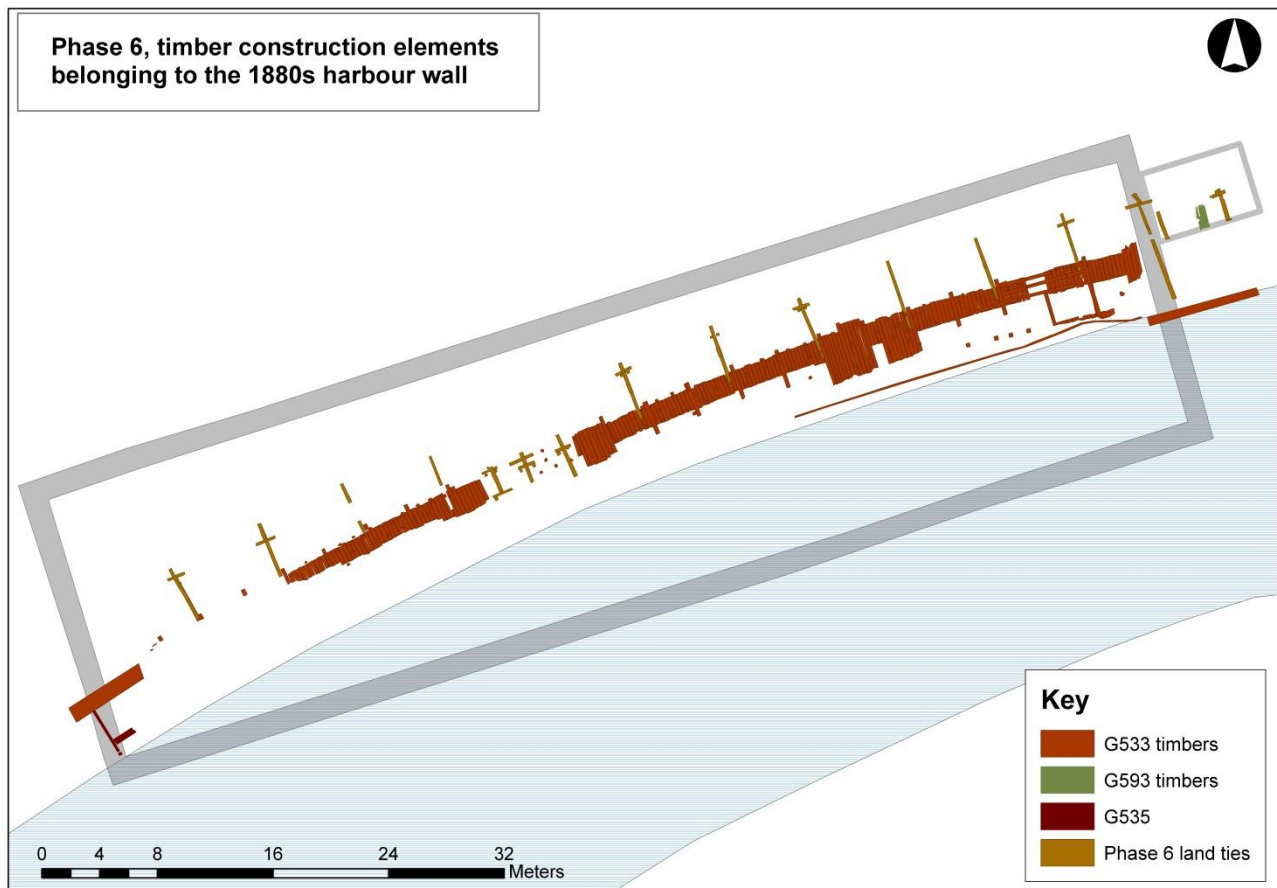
Plan showing the timber elements of the 1880s quay wall including the timber planking foundation and sixteen land ties
